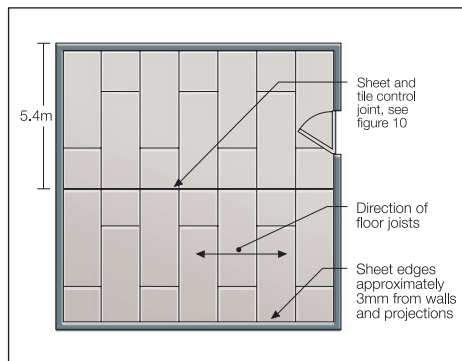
SHEET CONTROL JOINT LAYOUT
